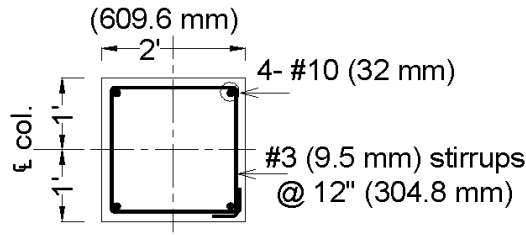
CROSS SECTION OF A TYPICAL PRE-1970 RECTANGULAR REINFORCED CONCRETE COLUMN IN OREGON, USA.
